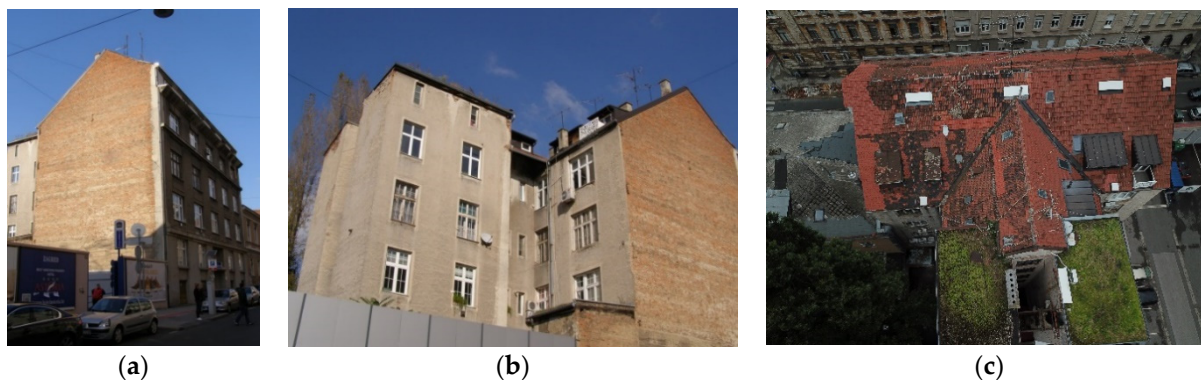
Photographs of the case study building: (a) south- and street-facing facade; (b) side view; (c) aerial view.
